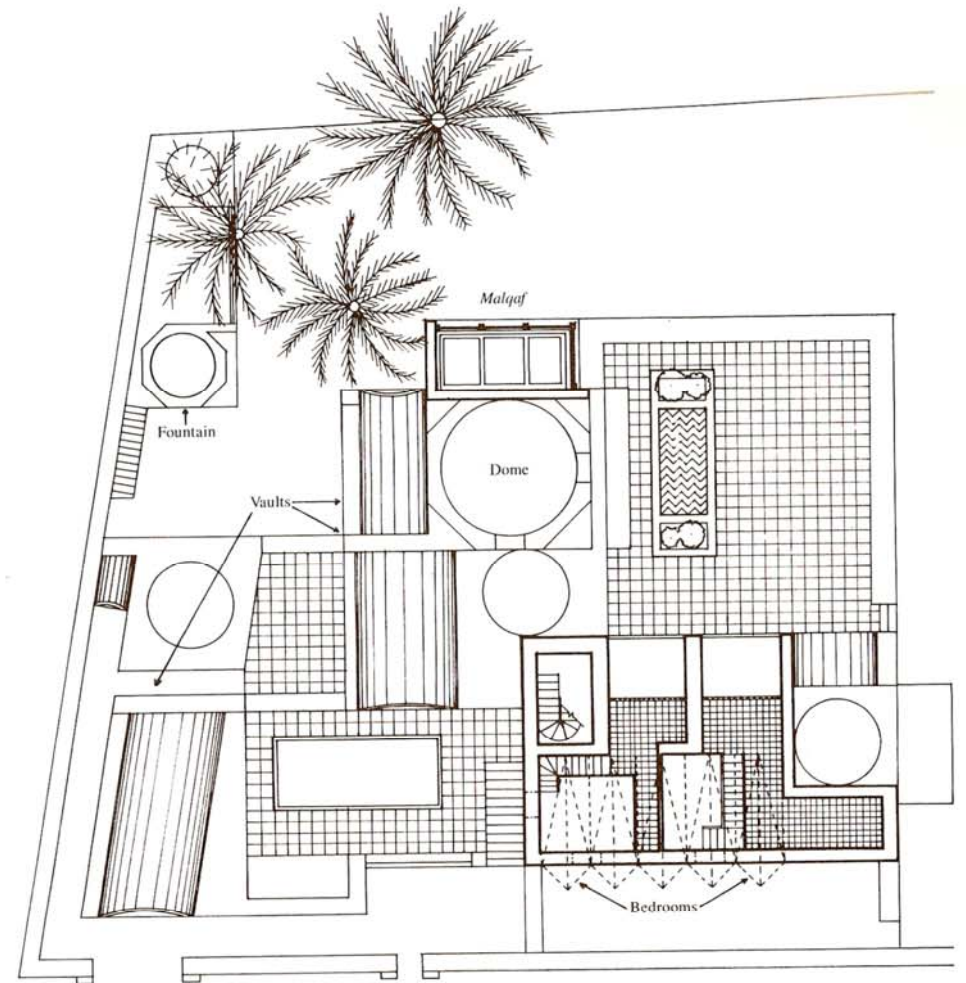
Roof plan of the Fu'ad Riyad house in Cairo, showing the *malqaf*, dome, vaults, and fountain, with sectional plan details. (See p. 63.)
